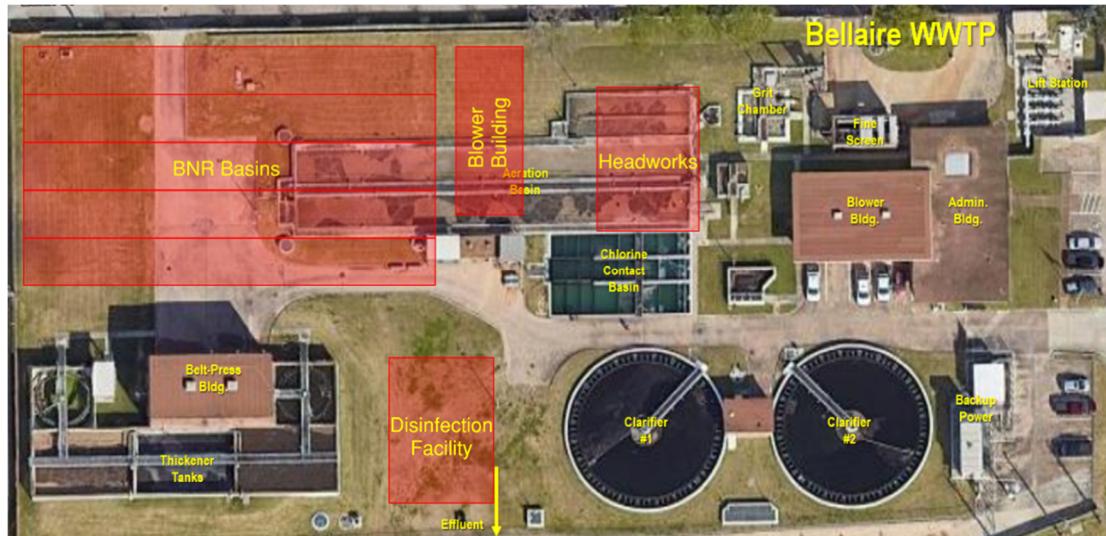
Preliminary Site Plan for 2.5 / 6.25 mgd CAS System
